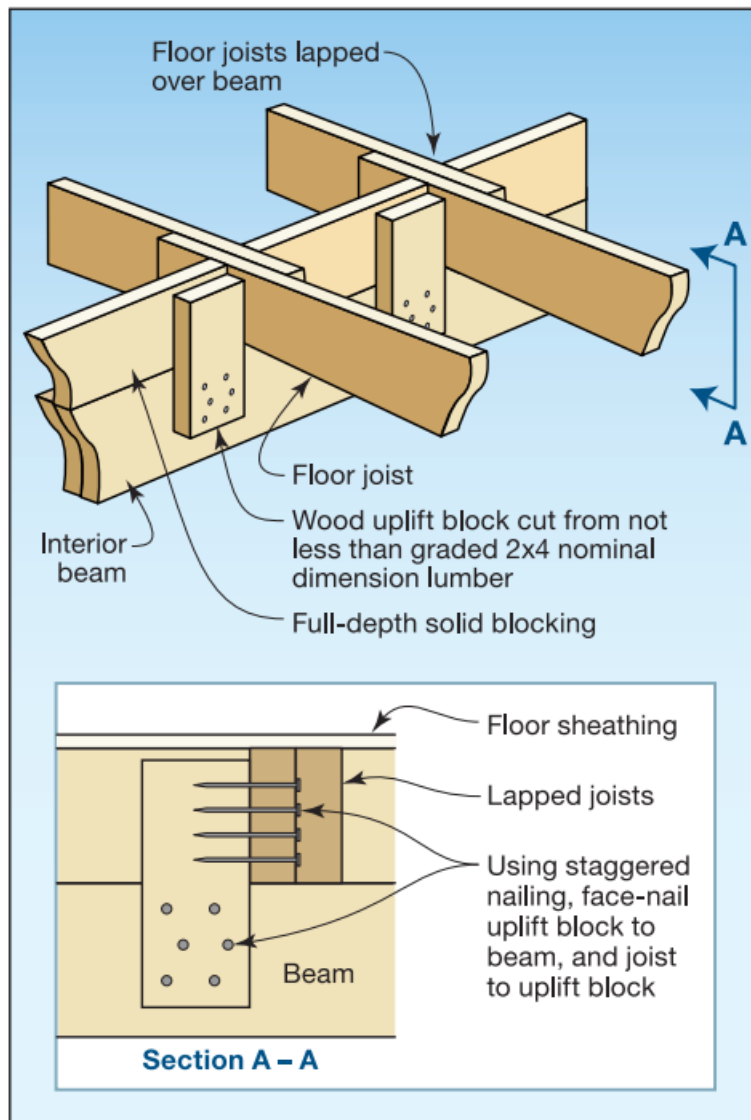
Detail of an elevated floor-to-beam connection using wood uplift blocking and full-depth solid blocking
